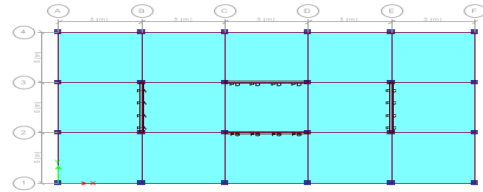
MODEL II - Building with shear wall at intermediate walls
